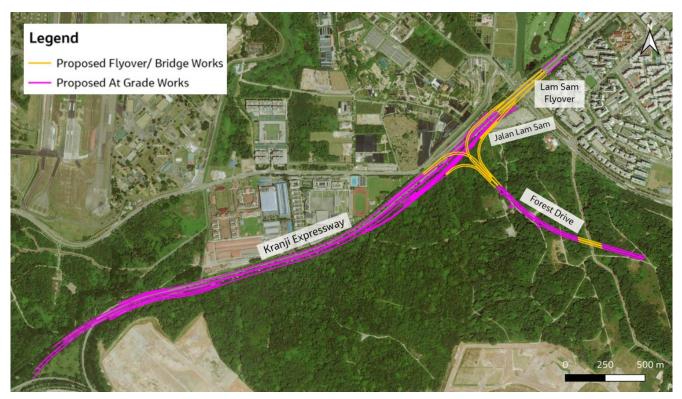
Proposed At Grade Works and Bridge Works for the Project Source: ESRI
